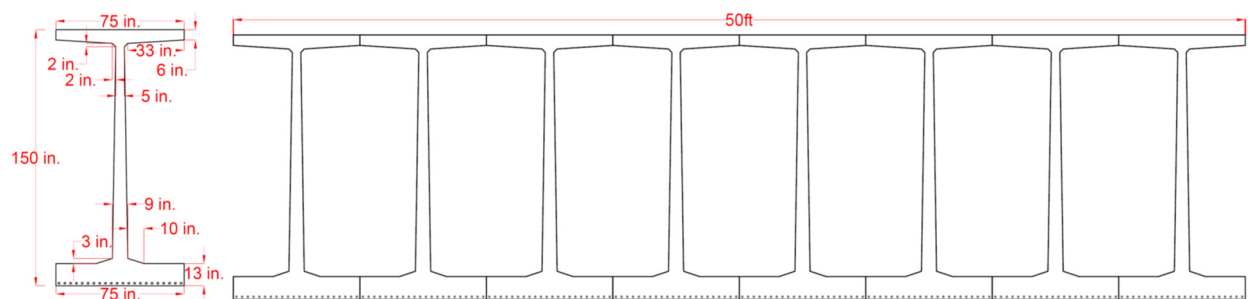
Prototyp 250-ft long non-prestressed UHP-FRC DBT girders (1 in. = 2.54 cm; 1 ft = 30 cm)
